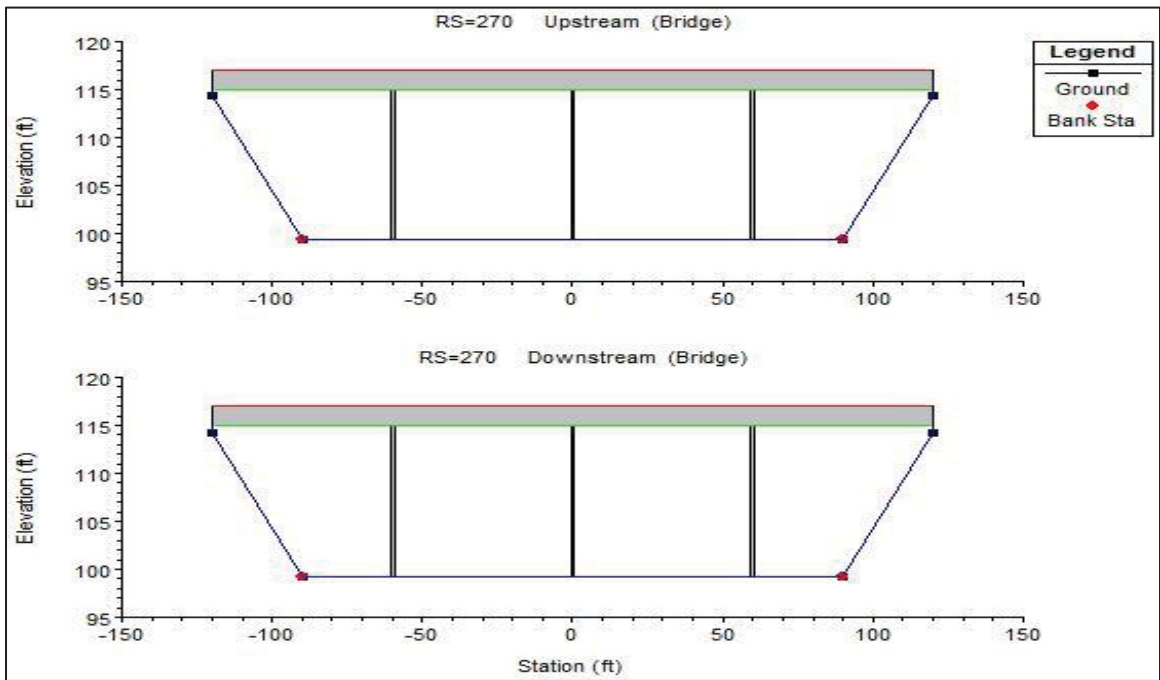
Bridge cross-section with pier location in the channel with 180 ft bottom width.
